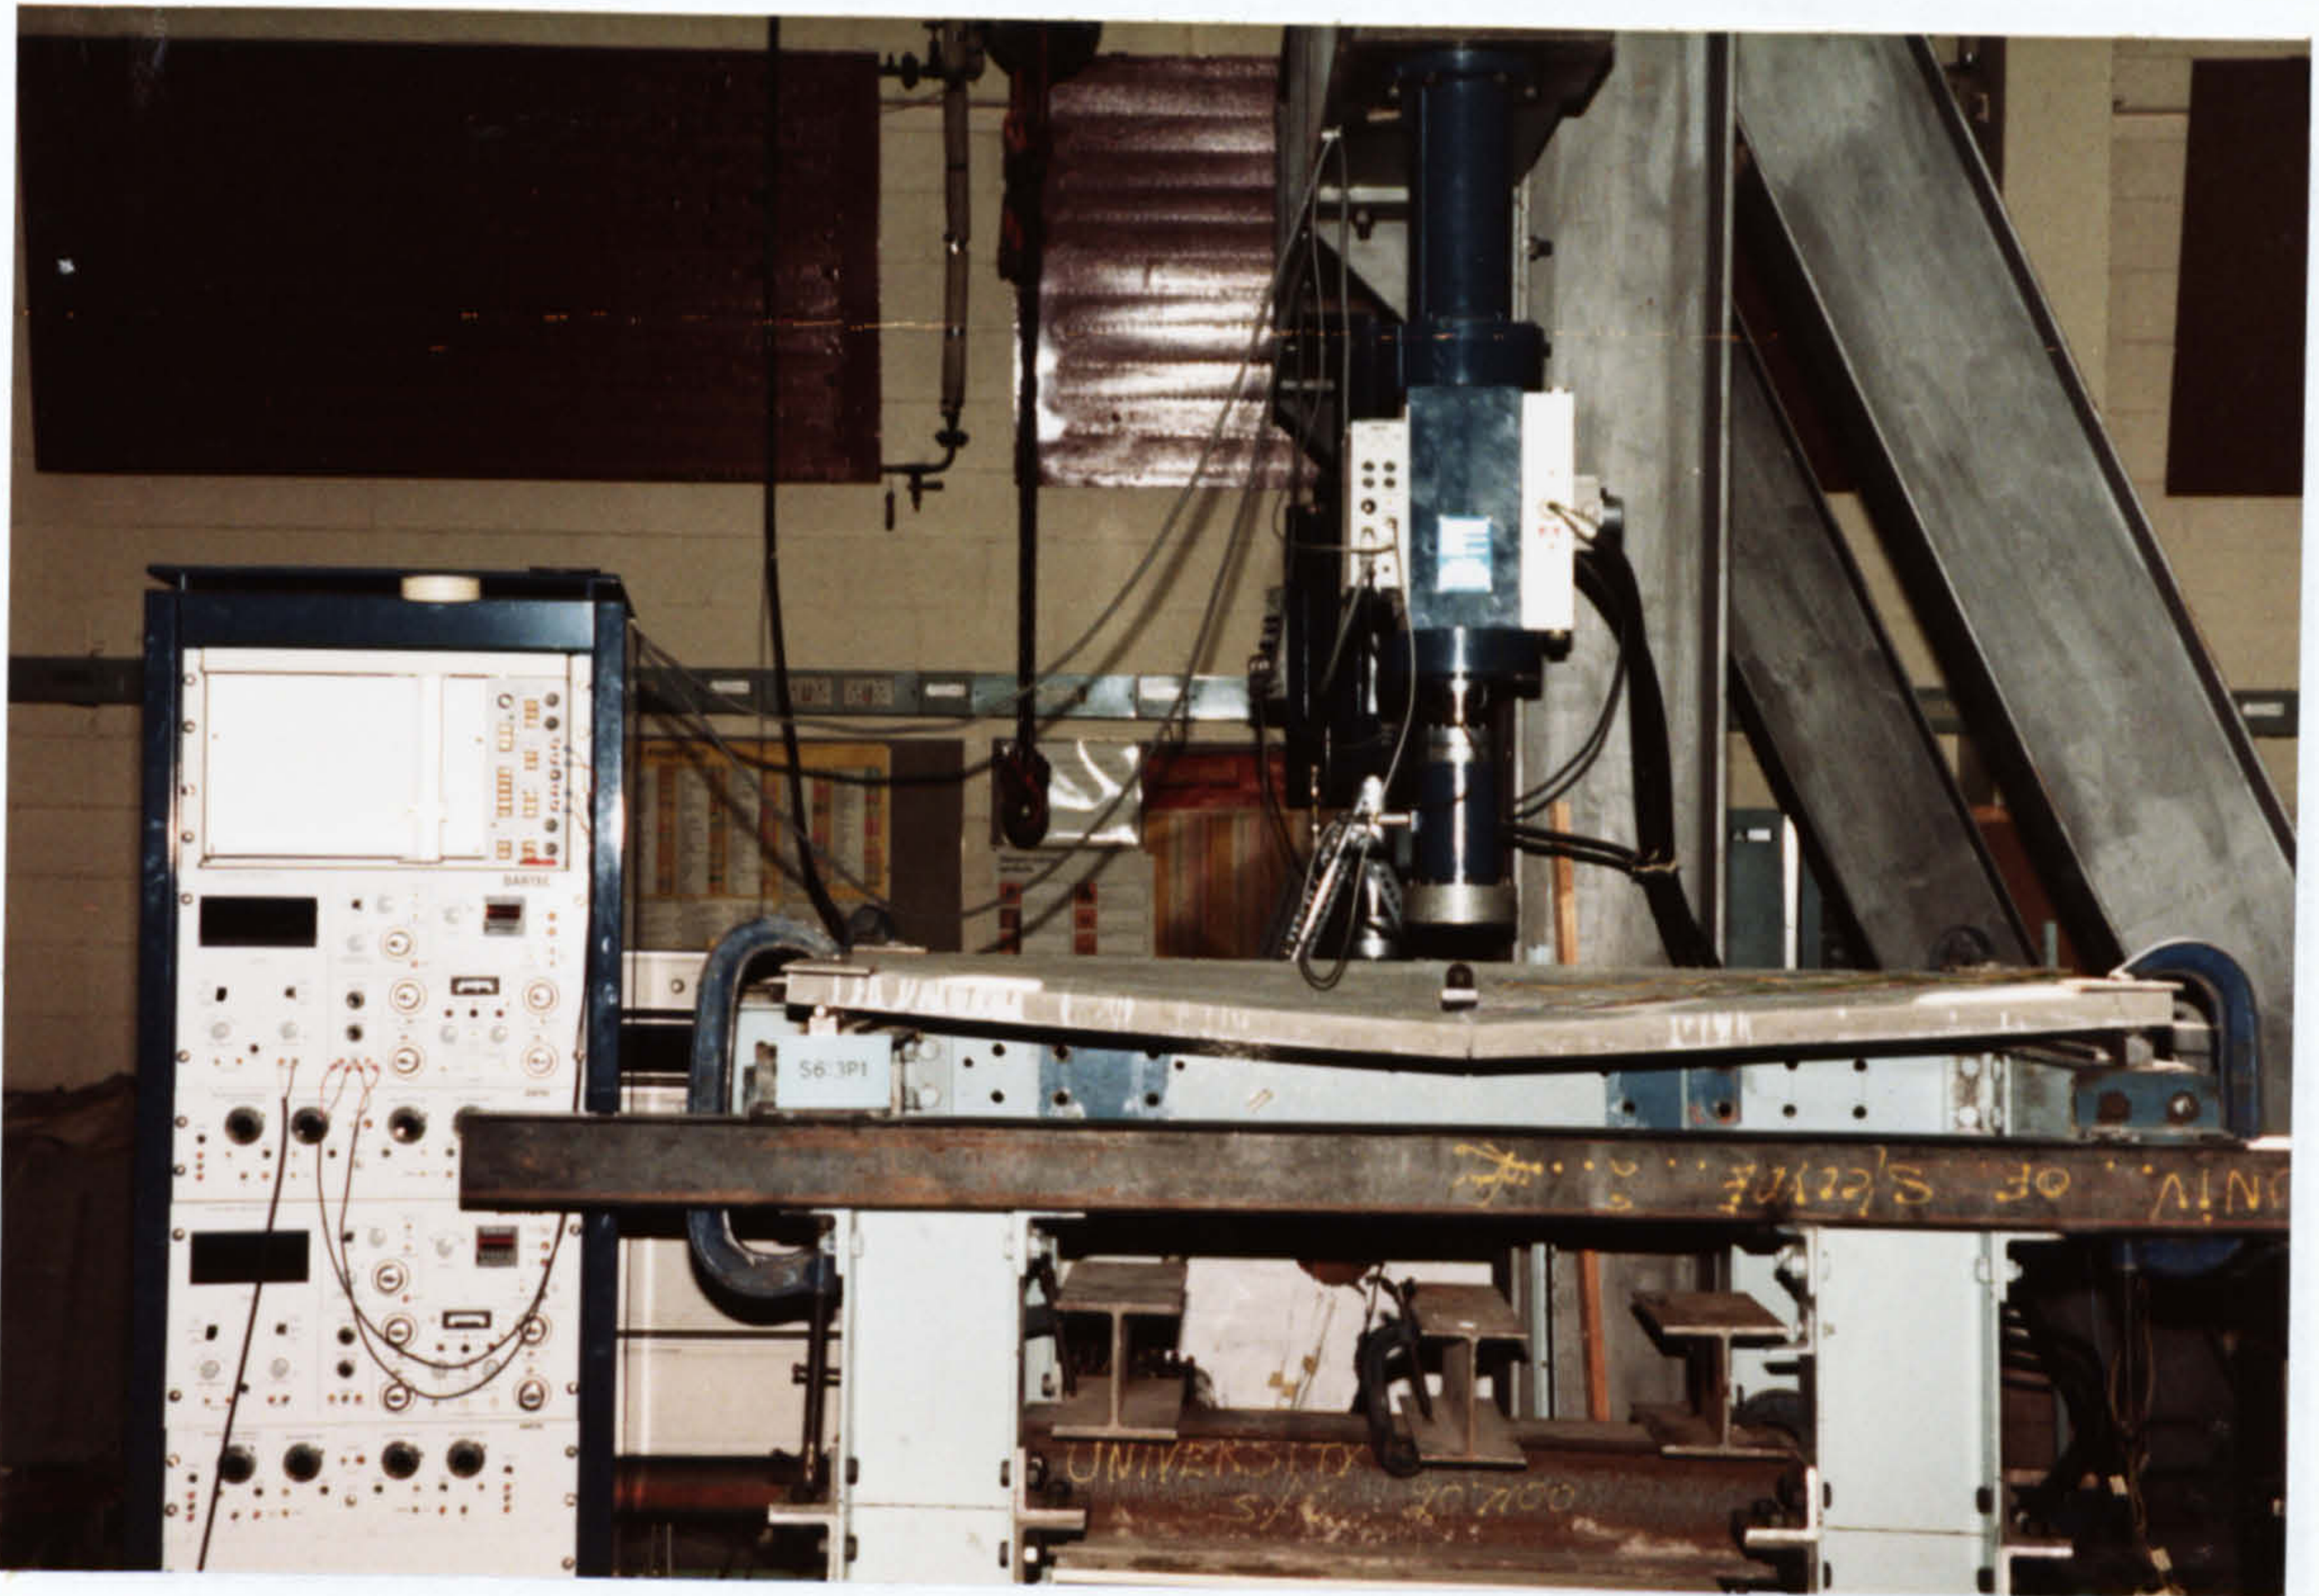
Single Point Loaded Rectangular Slab S63P1
